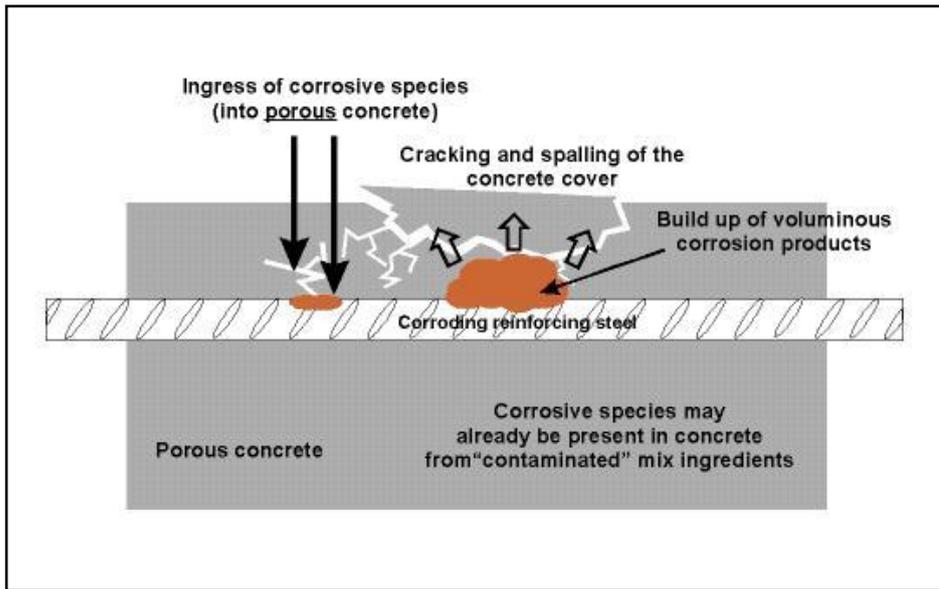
Mechanism of deterioration of reinforced concrete (Corrosion-Club.com, 2002)
